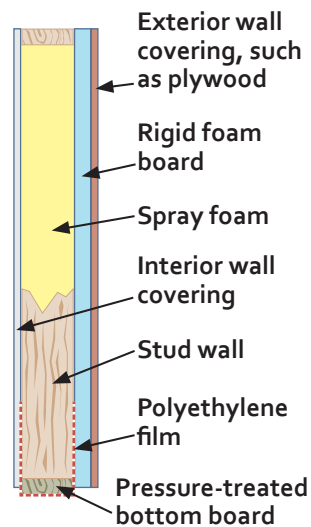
Wall section with foam between studs plus foam board on one side. (Sanford)
